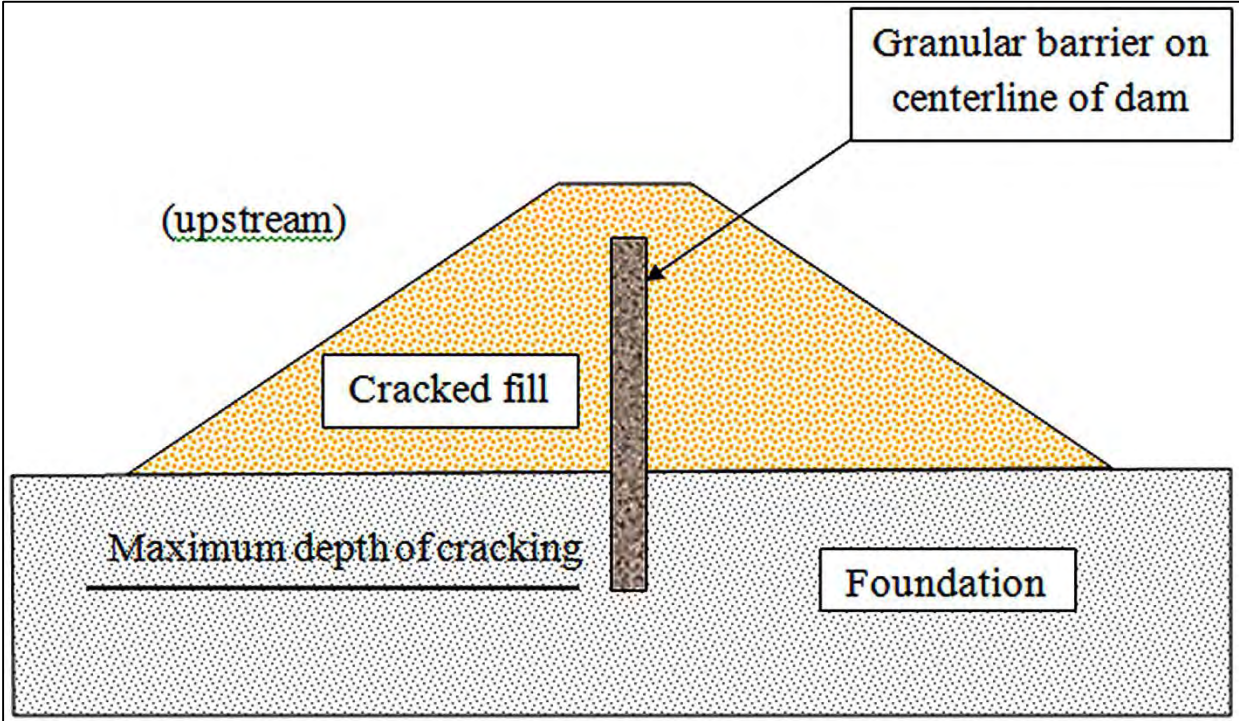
Granular barrier on centerline of a cracked embankment in a normally dry dam (barrier should extend at least to the maximum pool elevation).
